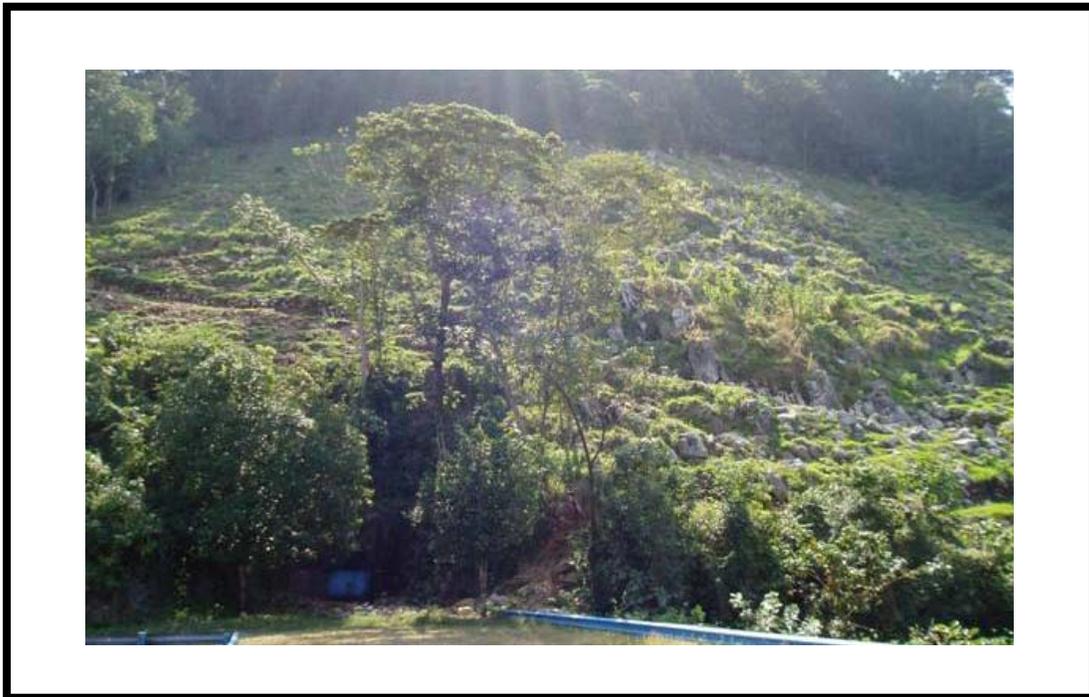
The tunnel will be constructed underground through this hill using explosives.
